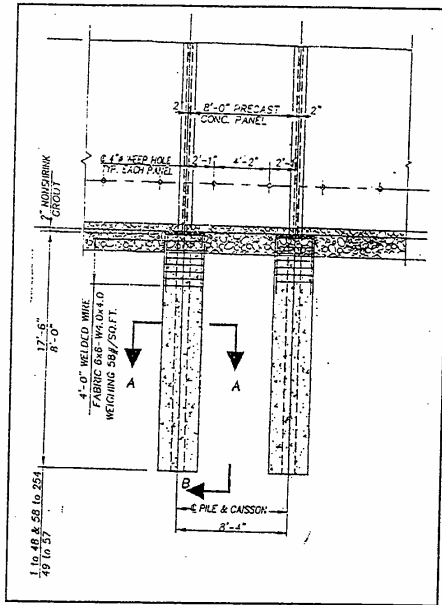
Typical Example of a Composite Wall's Pile and Post Design Details
